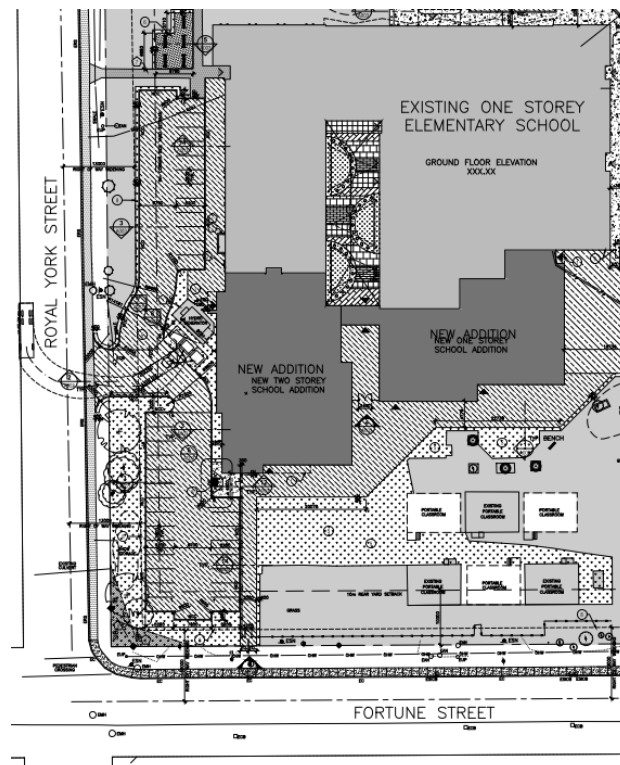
Site Plan of the Proposed St. Philip Catholic School Addition
